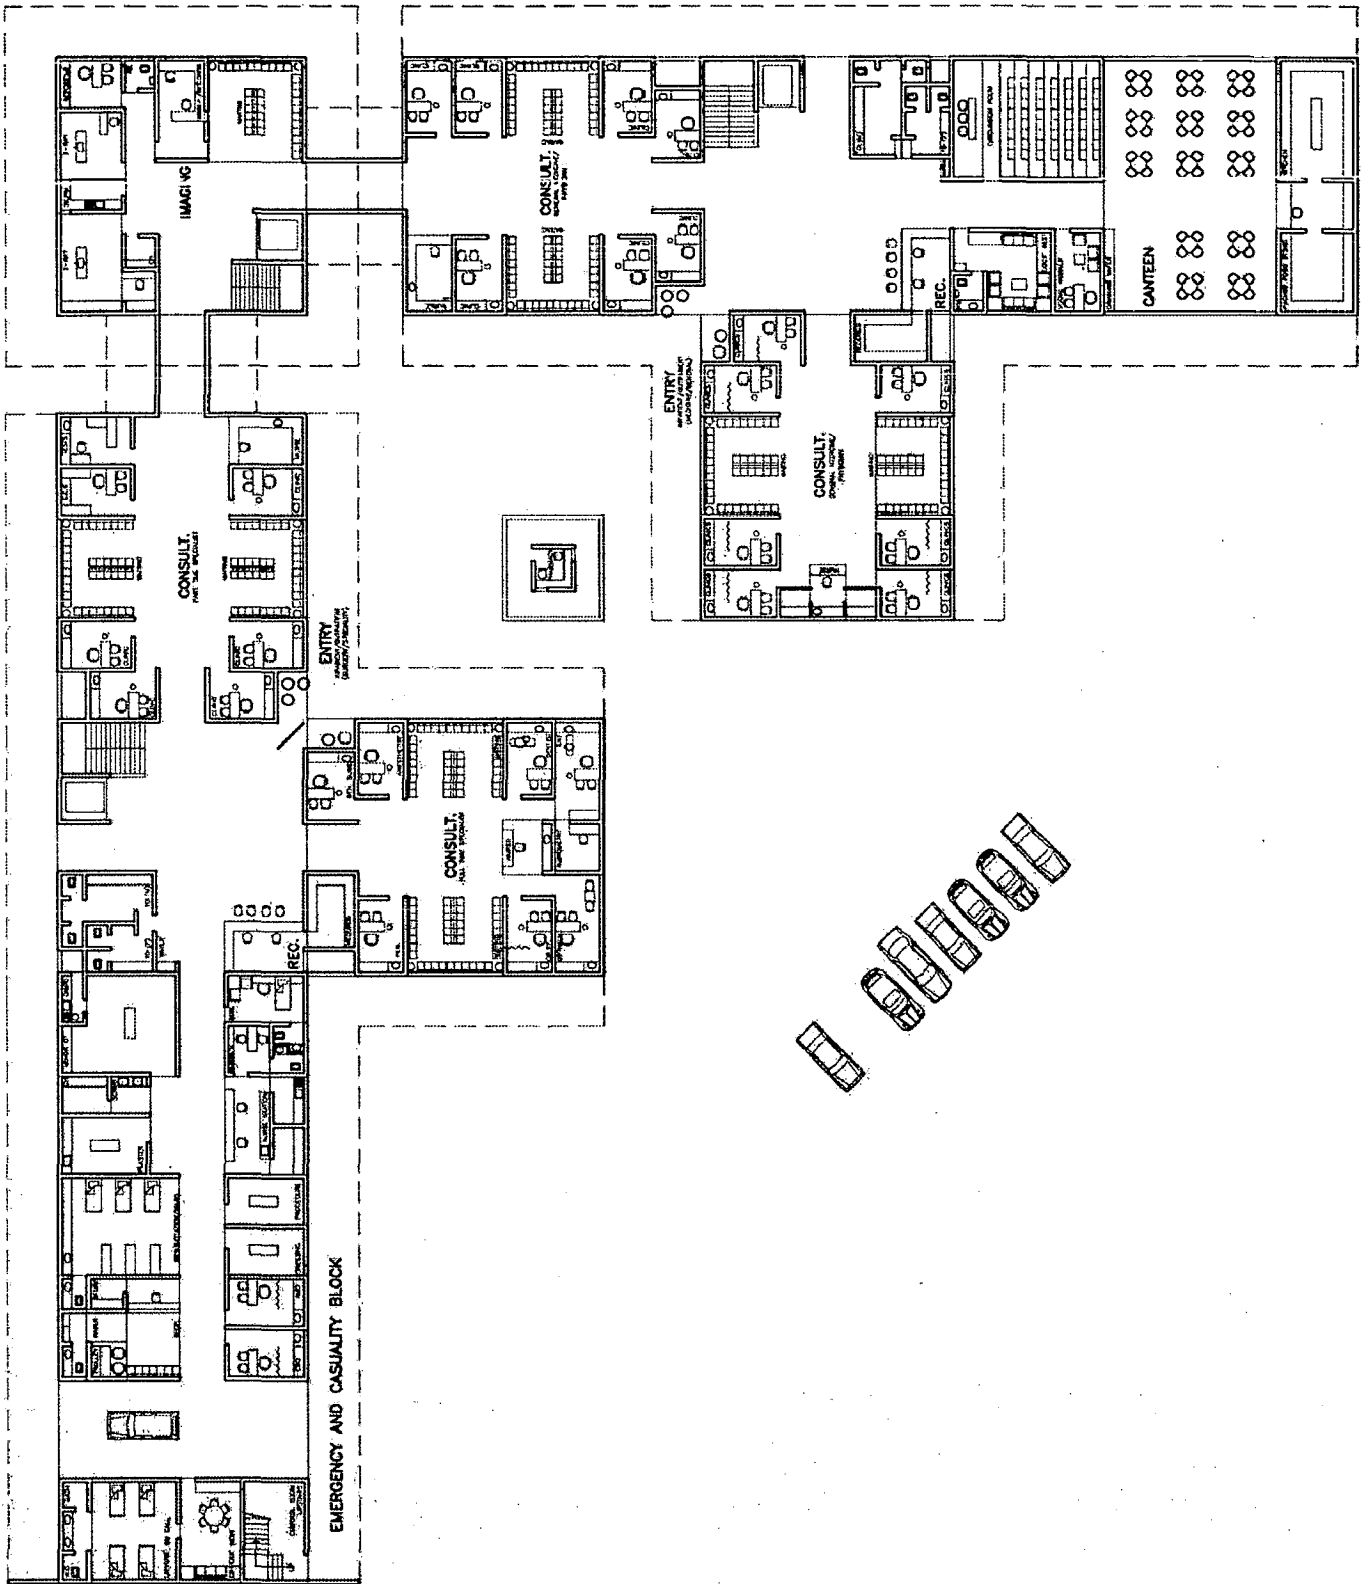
CITY HOSPITAL – GROUND FLOOR PLAN
